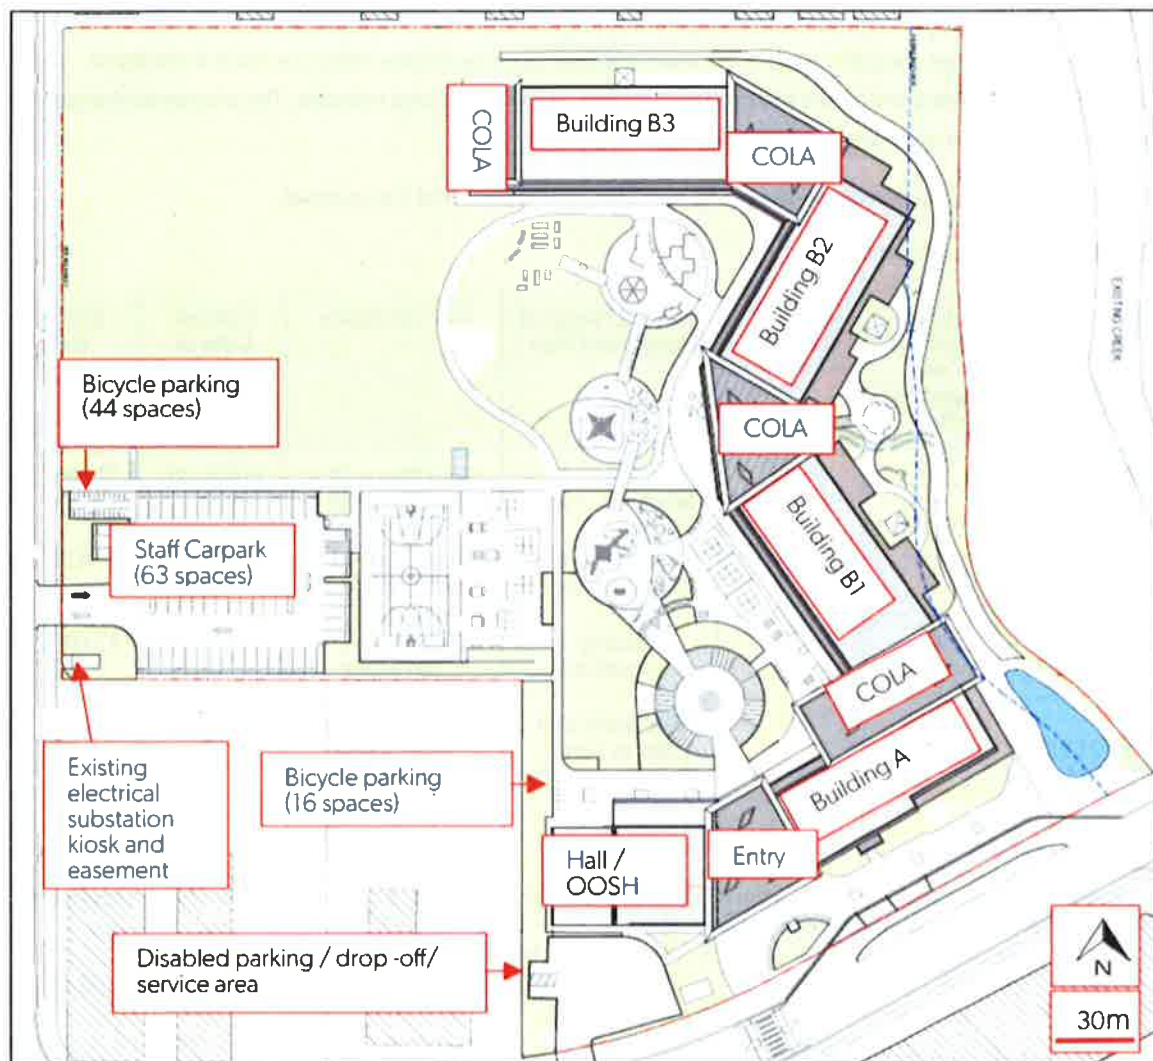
| Site Plan (Source: Applicant's Response to Submissions (RtS) for SSD 9354, 2019)
